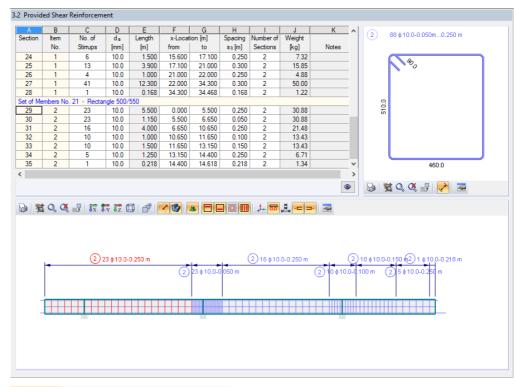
Window 3.2 Provided Shear Reinforcement
